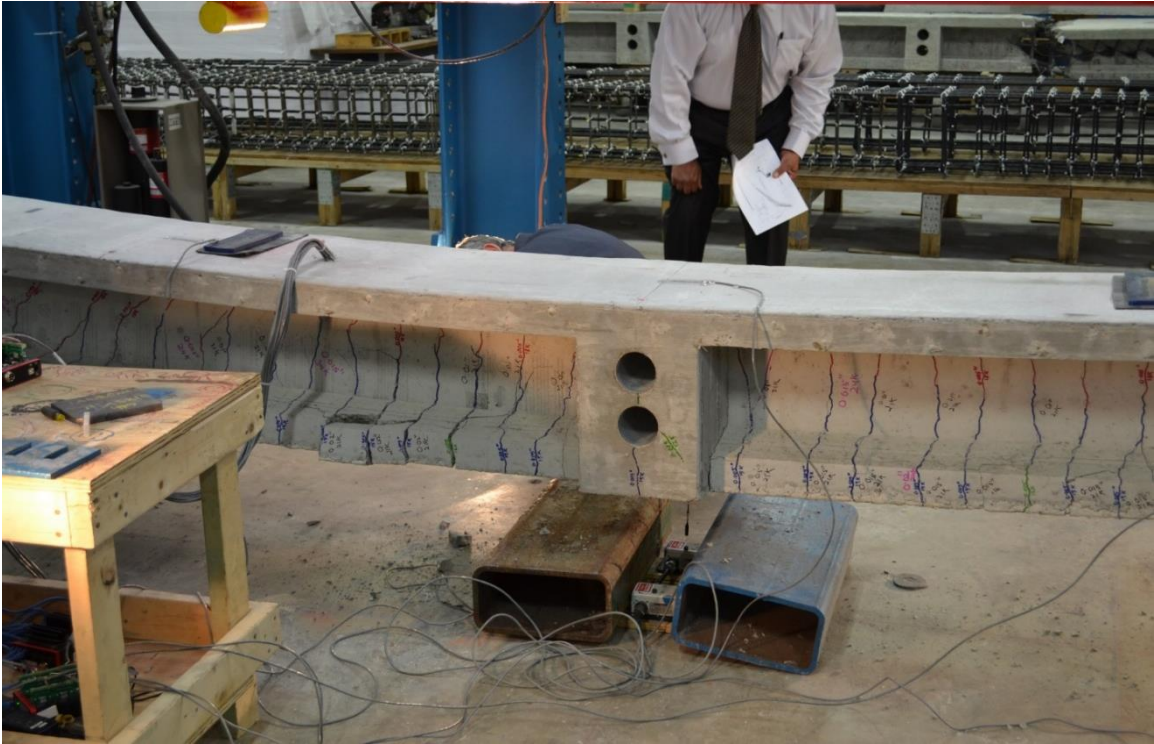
Spalling of concrete at failure in Beam C-S-F-U
